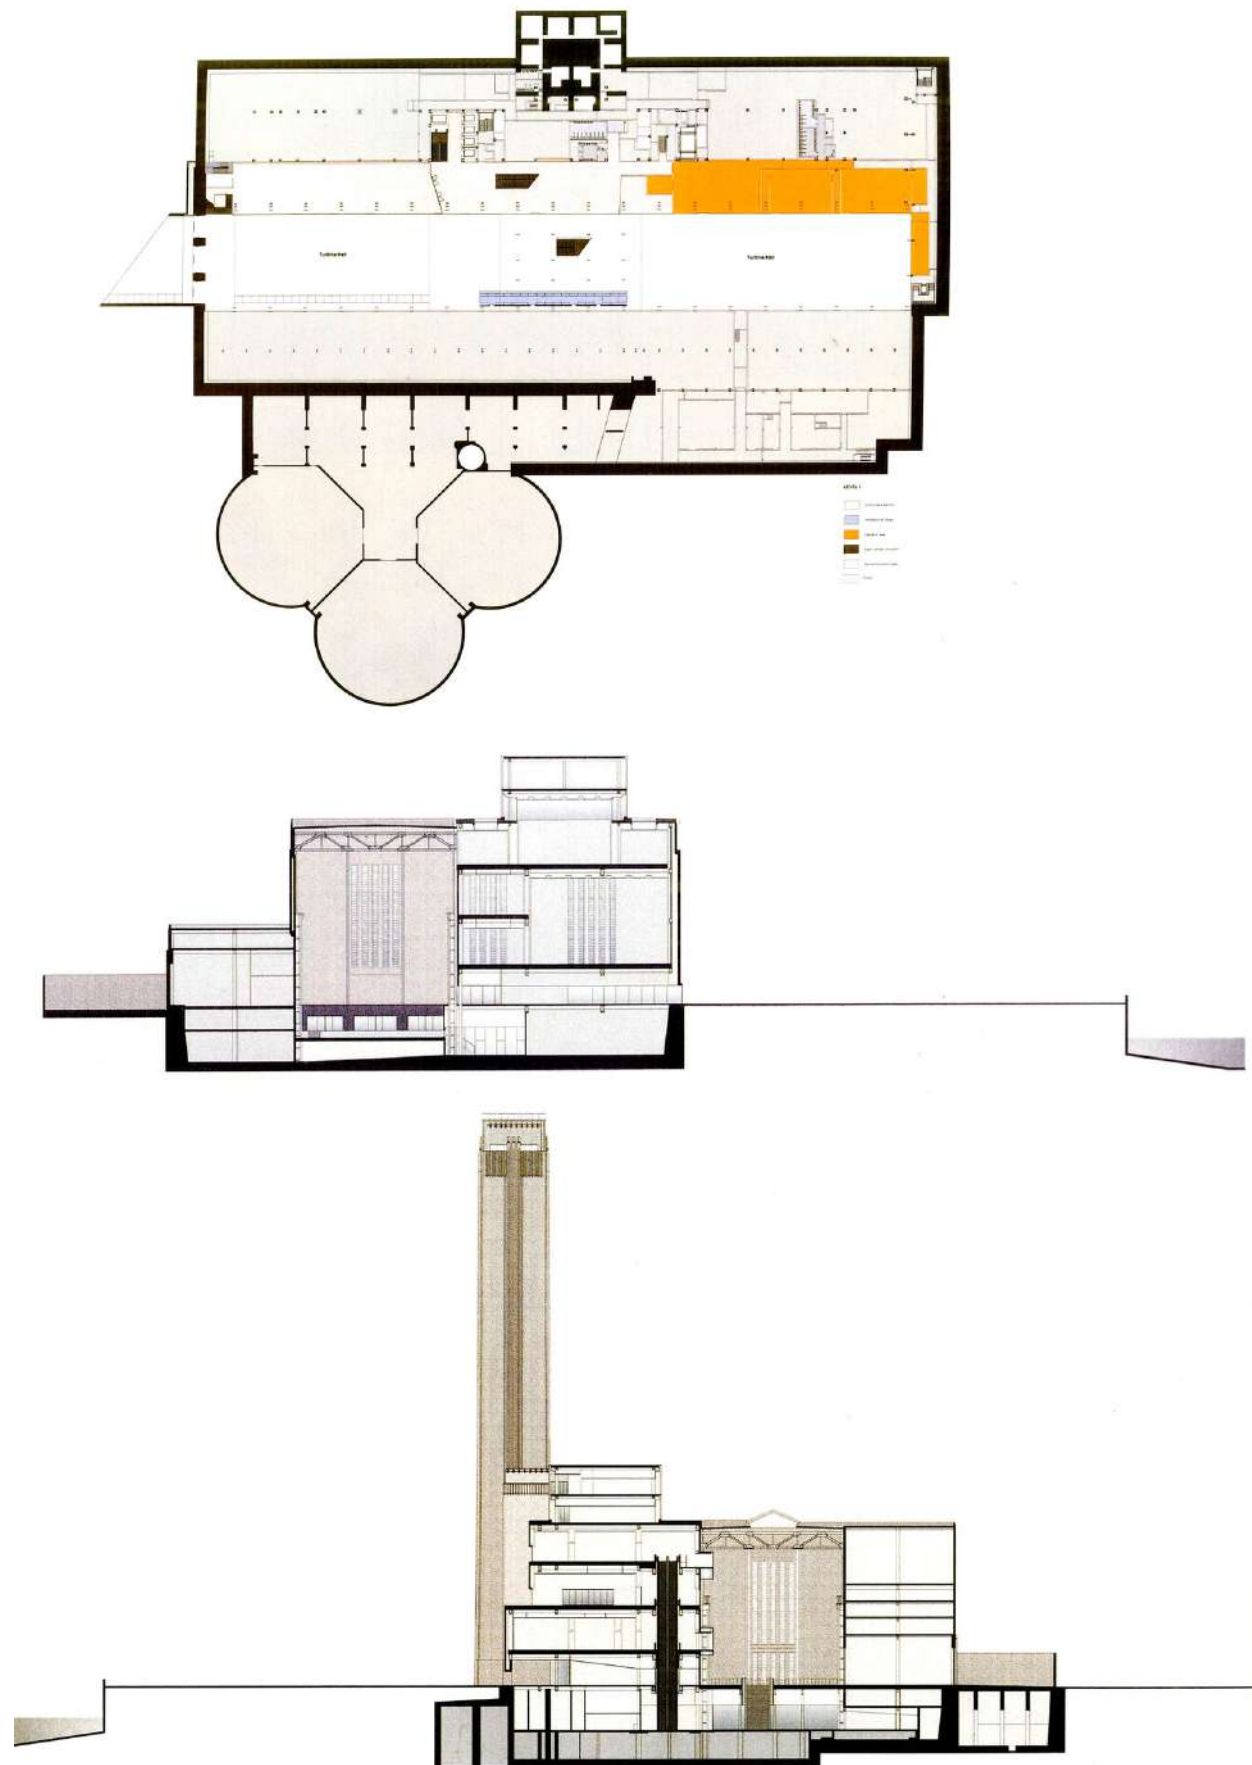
Tate Modern plan and sections. Source: ArchDaily.
